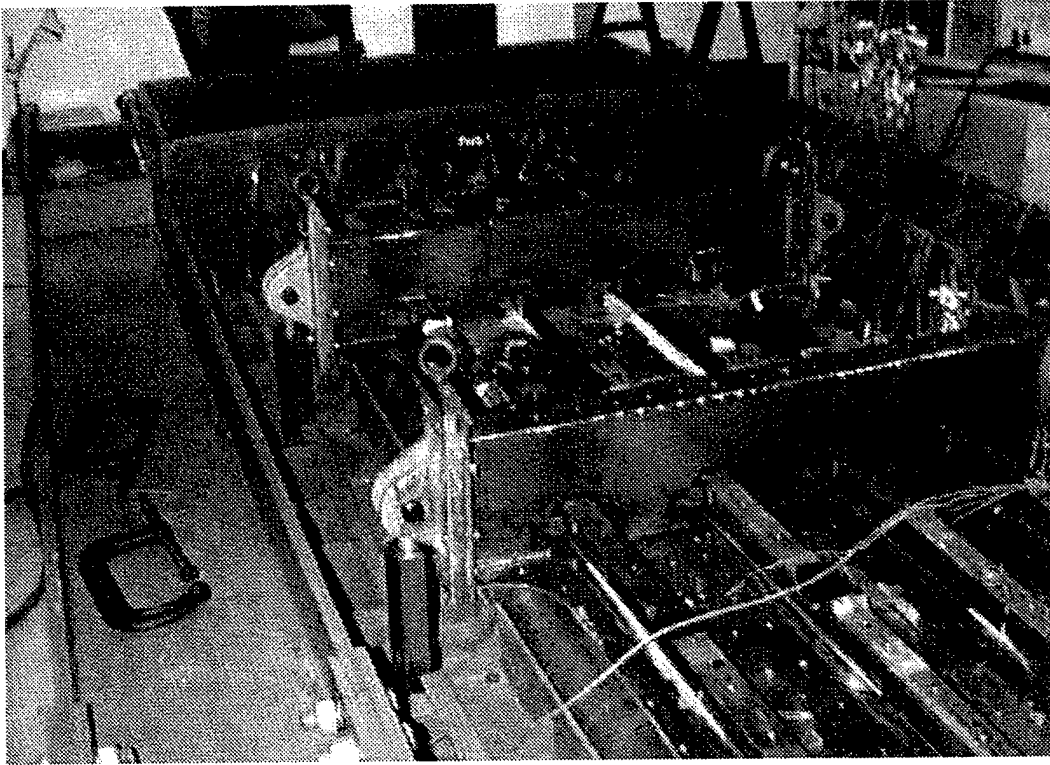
Grillage 0595 in Test Fixture After Collapse
